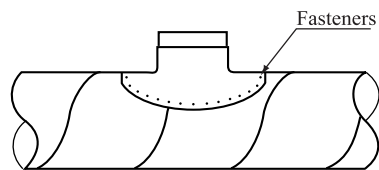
Saddle tap with spot-welds or fasteners.
